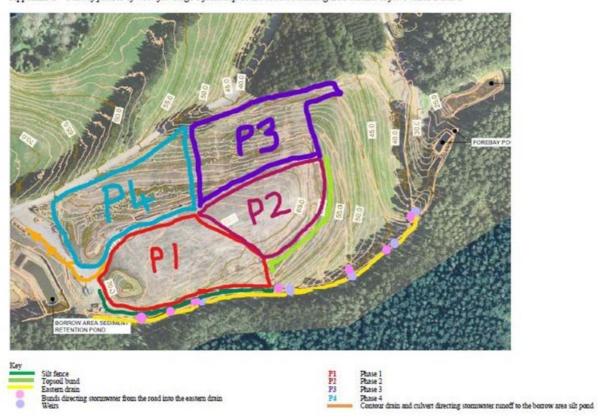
Plan of phases of work for Stage 3 final cap construction.
